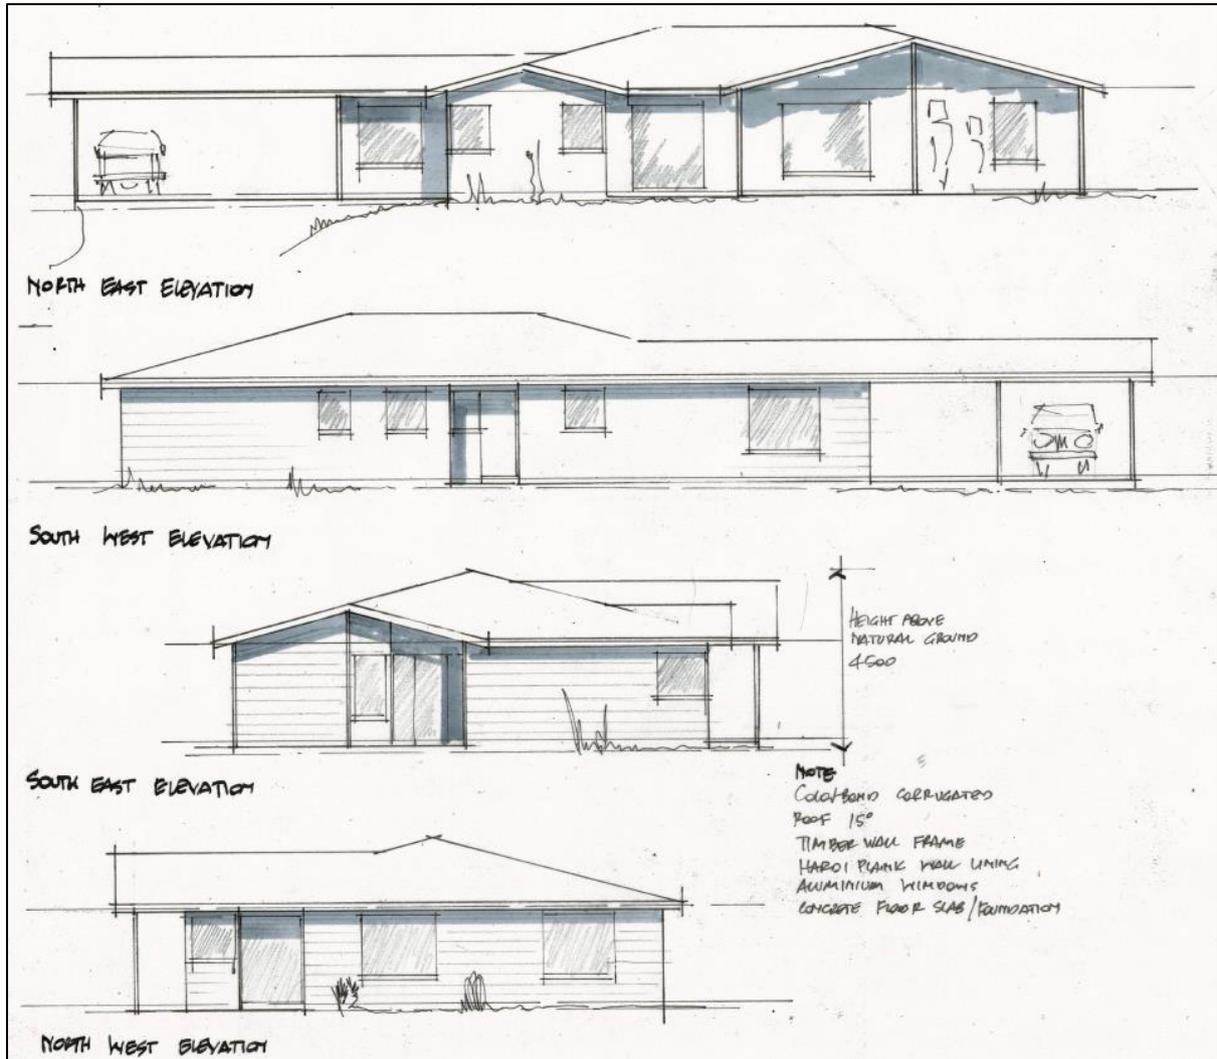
Farm dwelling elevation plan (Source: Building Design Service).
